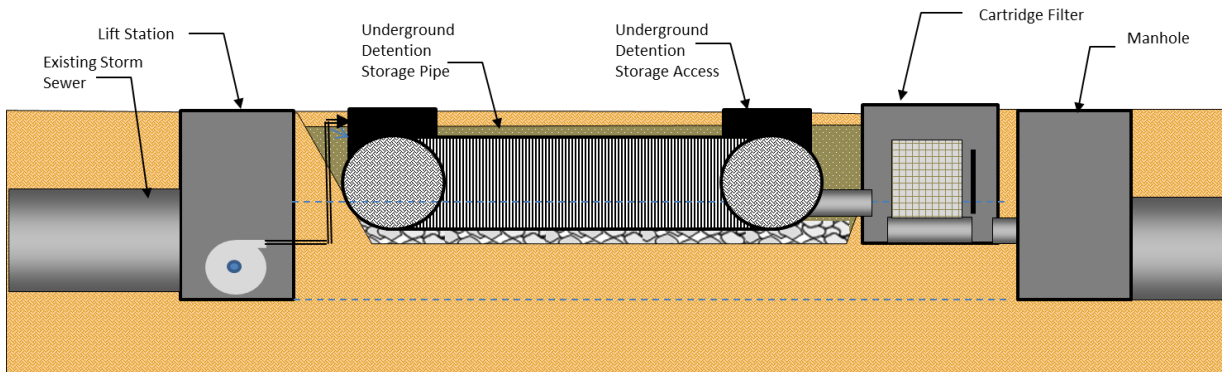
Underground Storage with Cartridge Filter and Lift Station
